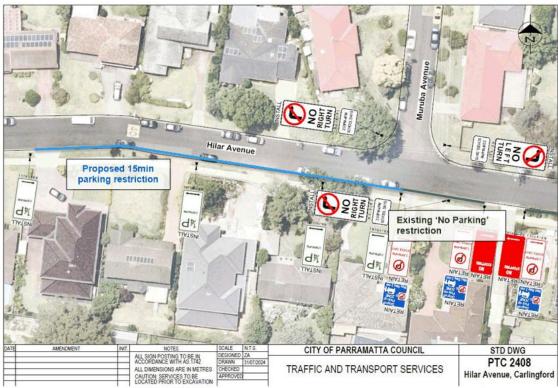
Concept plan of the proposed part-time turn restrictions in Hilar Avenue at Muruba Avenue, Carlingford
